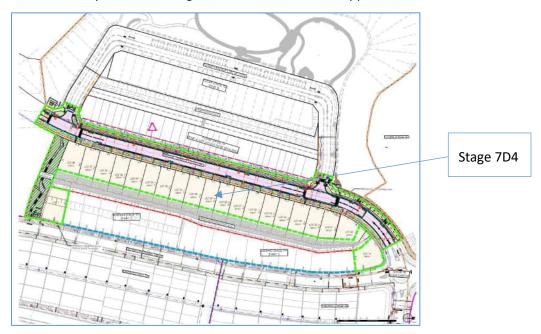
Stage 7D – extract from CJ Arms drawing 'Draft Subdivision Layout Plan'
